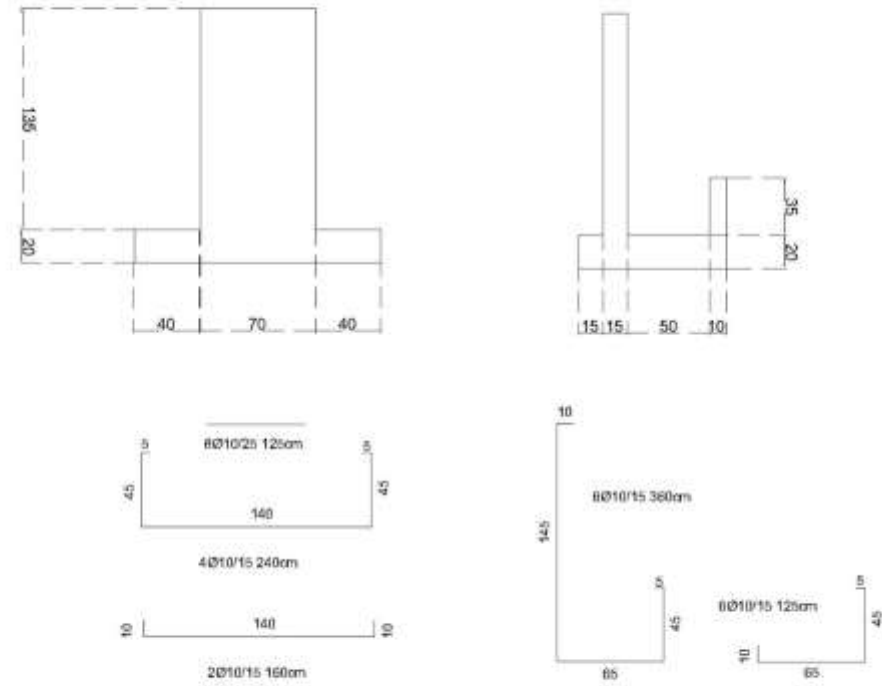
Supply Line Section // Çizim-2: İsale Hattı Kesiti
